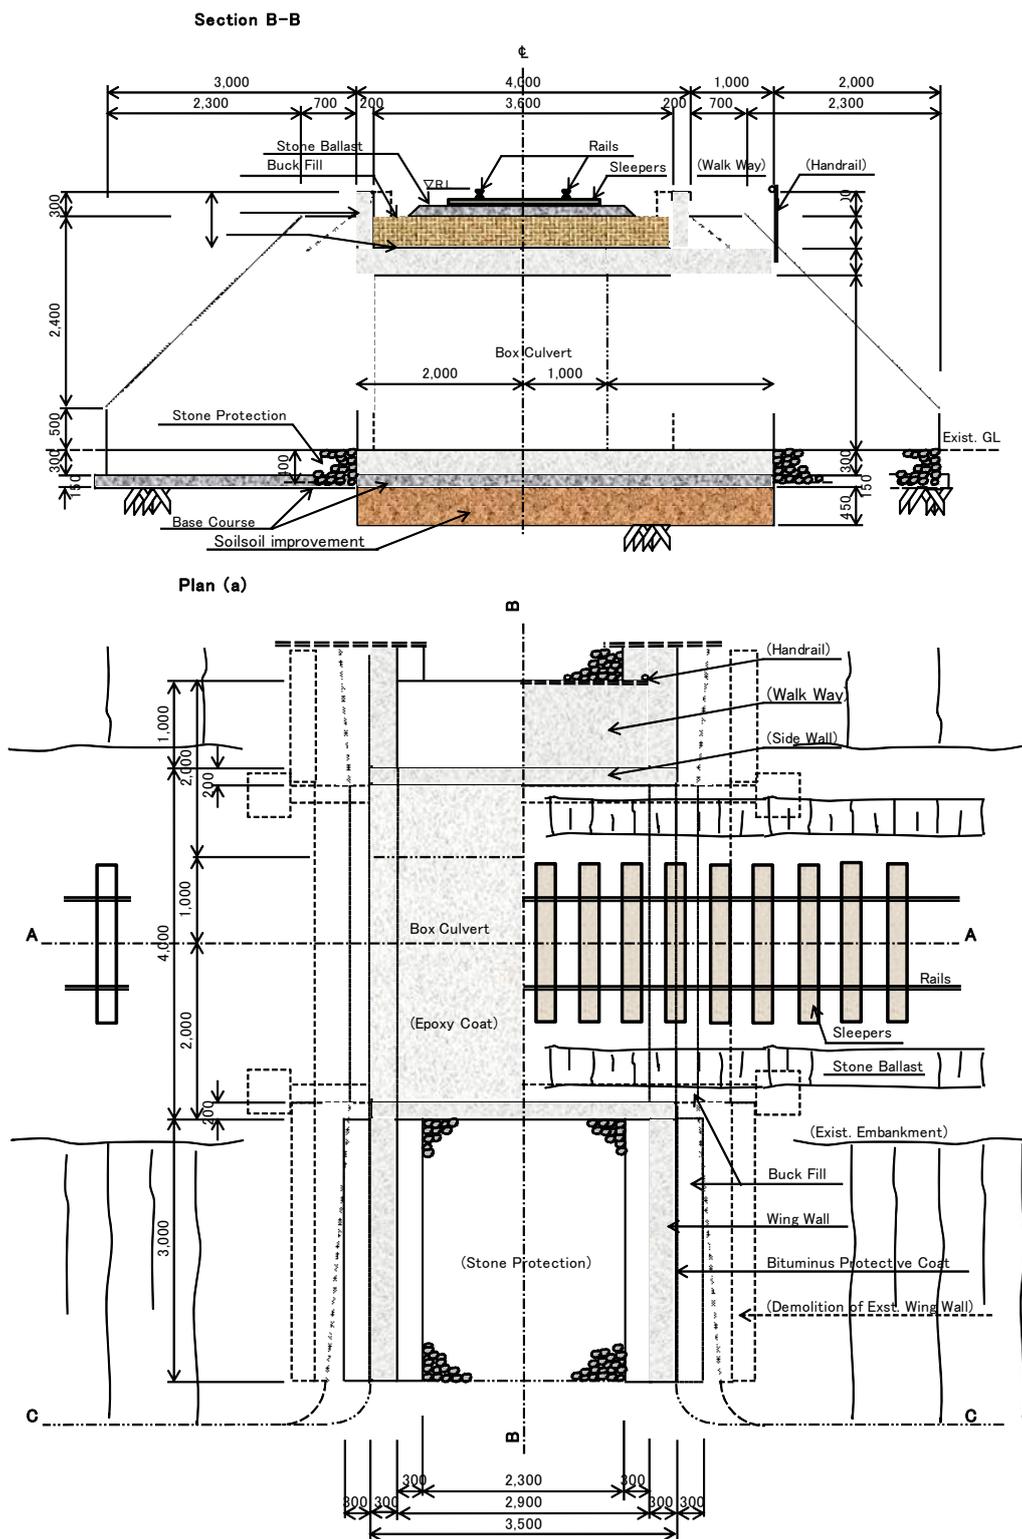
Box Culvert (Reconstruction Plan, 2/2)
